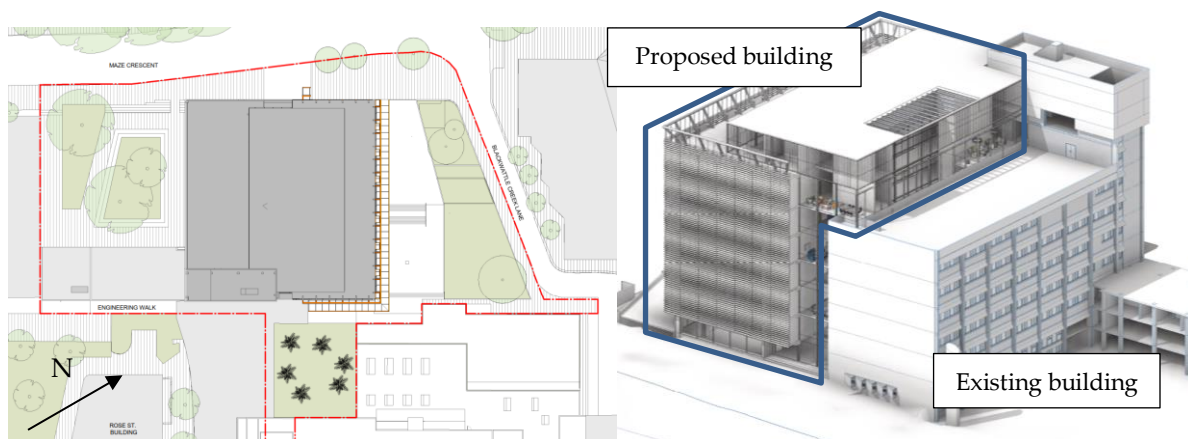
Level 1 floor plan (left) and 3D render (right) (Cox Architect, 2017)
